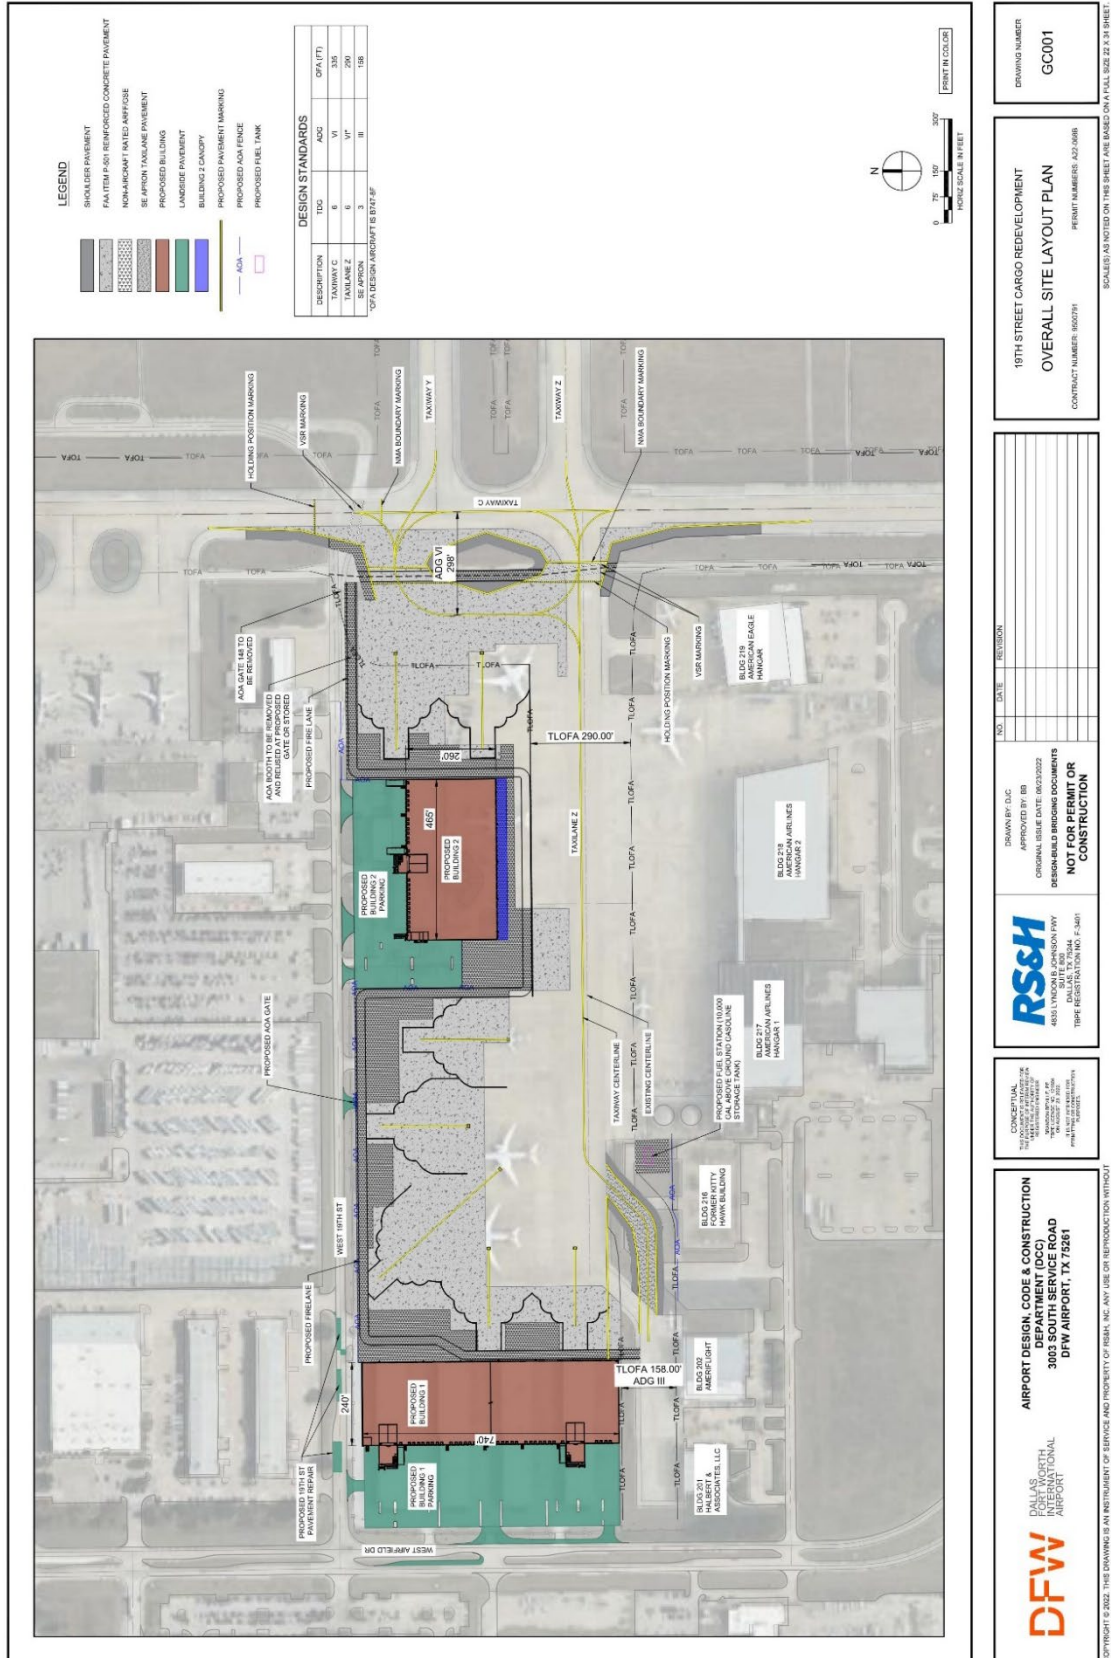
Overall Site Plan 19th Street Cargo Redevelopment
